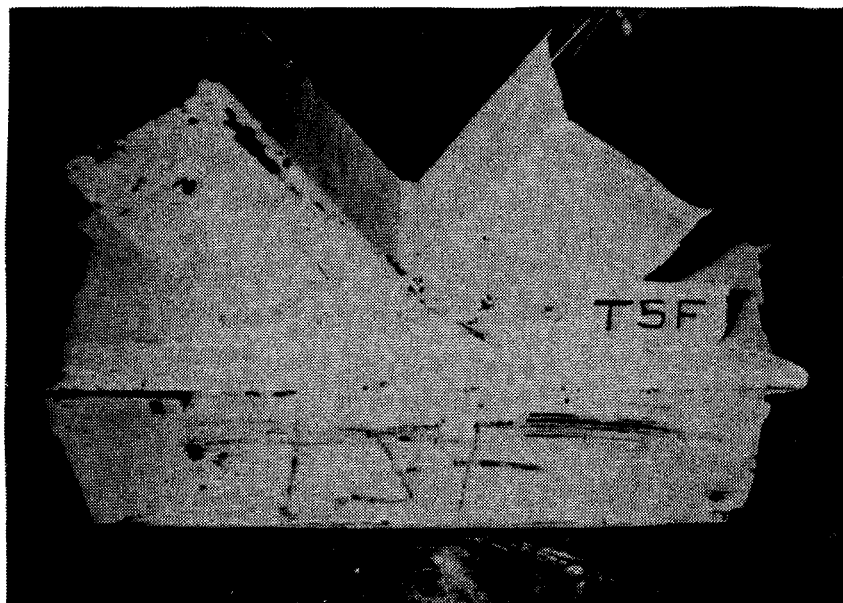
Fatigue Crack in Joint L1 (T5F)
